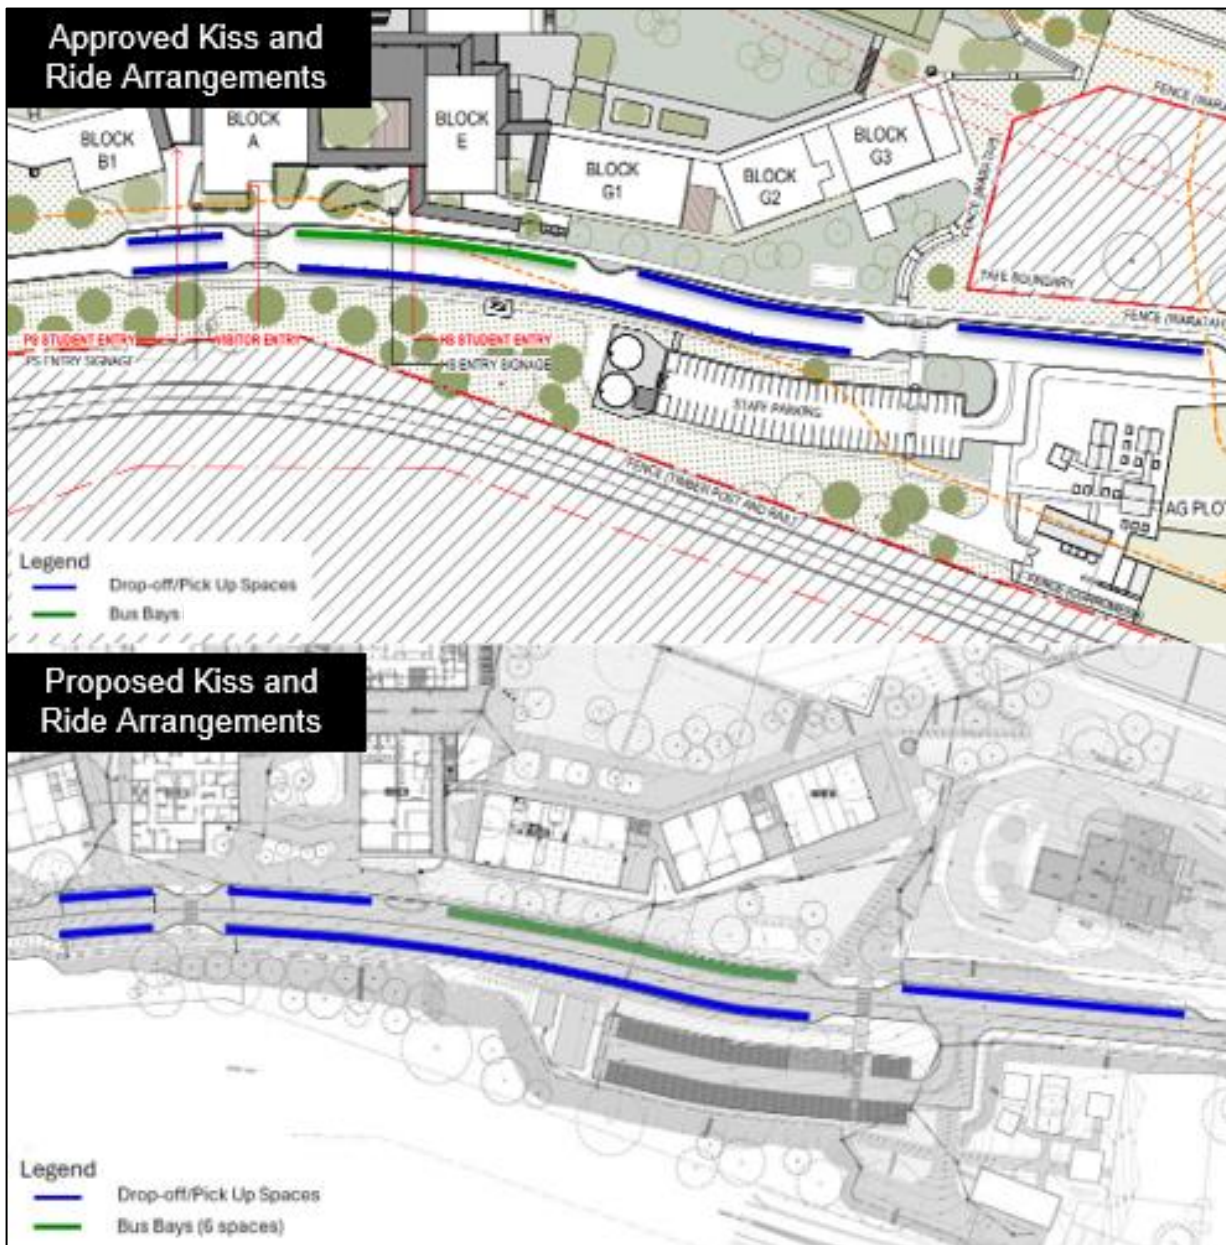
EXISTING AND PROPOSED KISS AND RIDE ARRANGEMENTS
